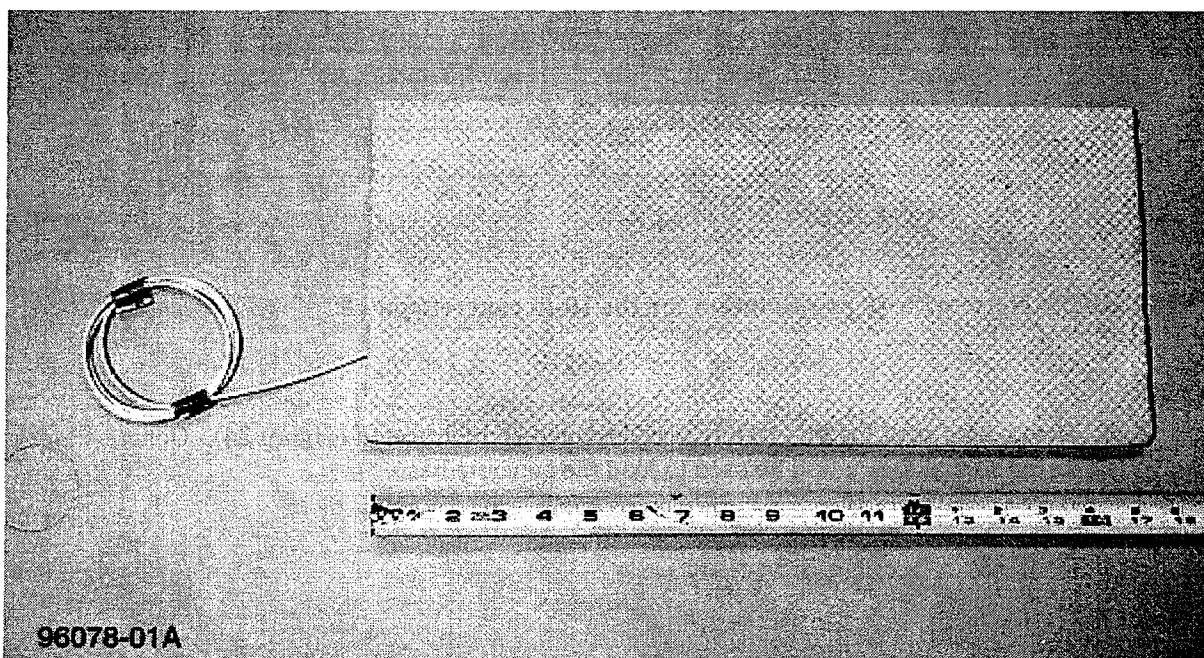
Concrete beam with embedded FO strain gage patches.
